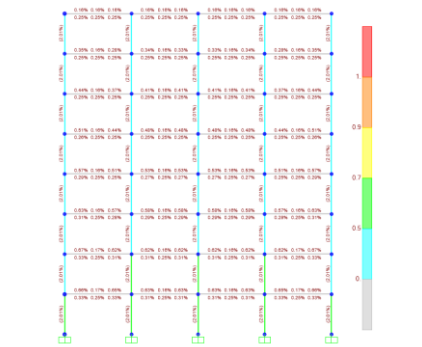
Structure's columns & beams max. percentage of longitudinal reinforcement (axis-1&3) in zone III
